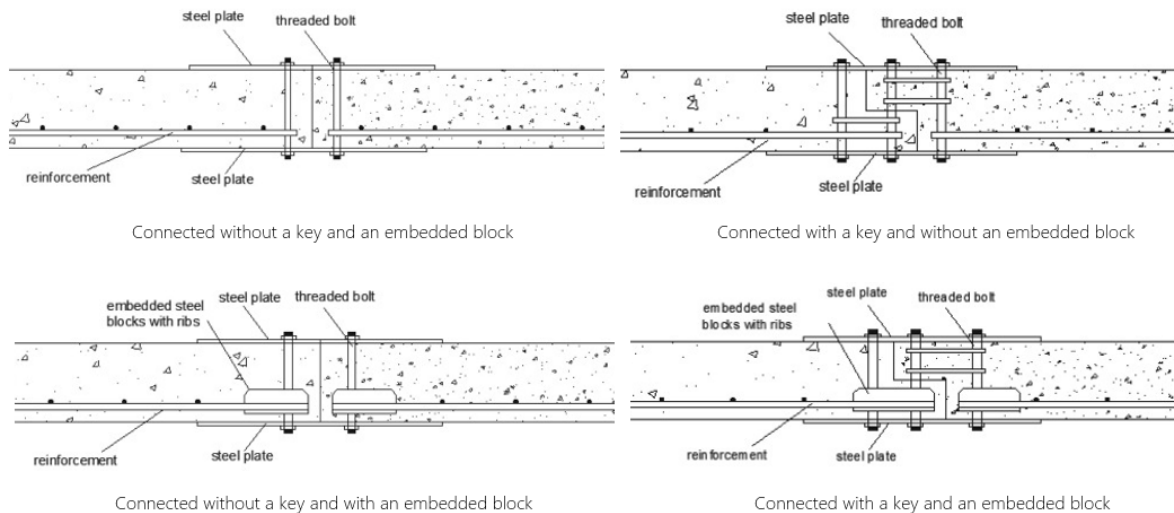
Specimen design alternatives with/without a shear key (half joint) and an embedded block [78]
